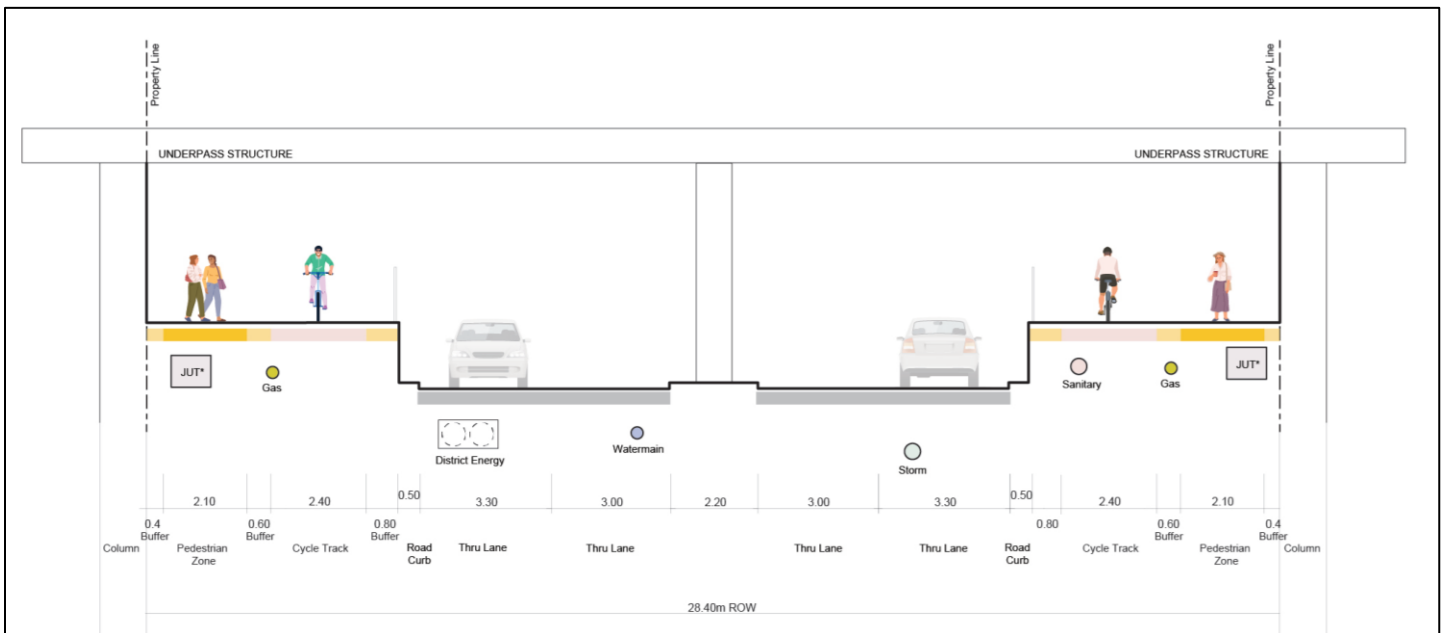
Northern Street (Underpass) Cross-Section – Option 2
